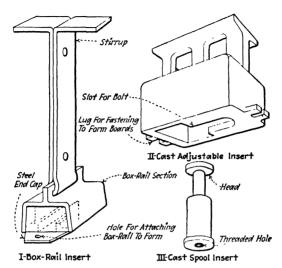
Socket inserts for making fastenings to concrete walls, ceilings, etc. (MIDWEST STEEL & SUPPLY CO., New York City). Inserts I and II provide some adjustment. The cast spool insert, III, provides none. It is intended only for supporting light loads.
